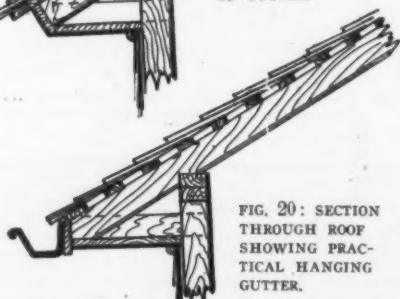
SECTION THROUGH ROOF SHOWING PRACTICAL HANGING GUTTER.
